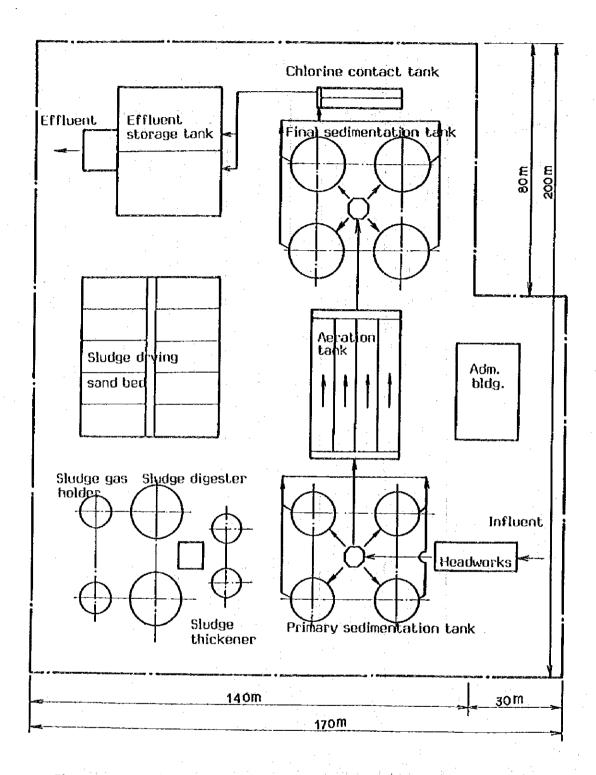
Layout Plan of Conventional Activated Słudge Process
